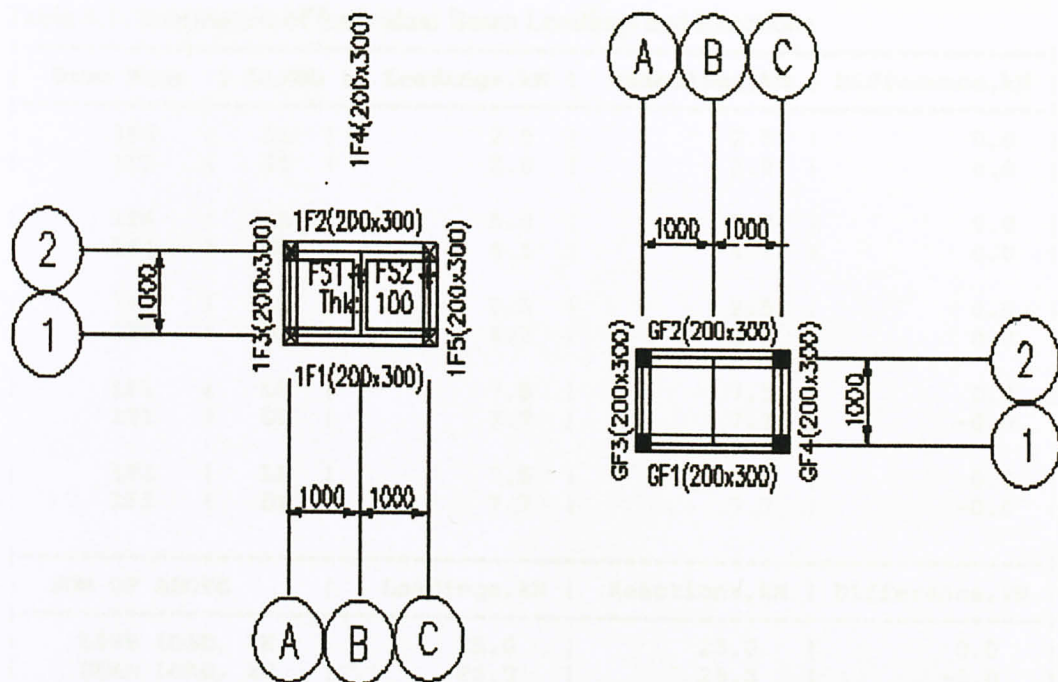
Key plan for the Water Tank Upper Floor (1F) and Ground Floor (GF)
